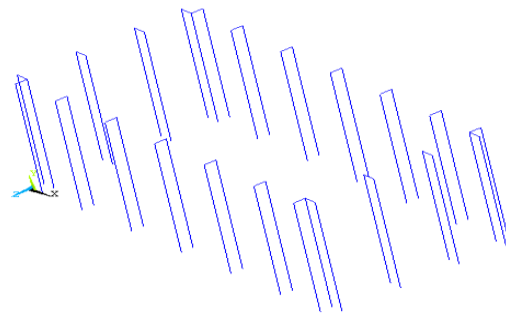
Configurations of containment reinforcement in URM buildings[9]
